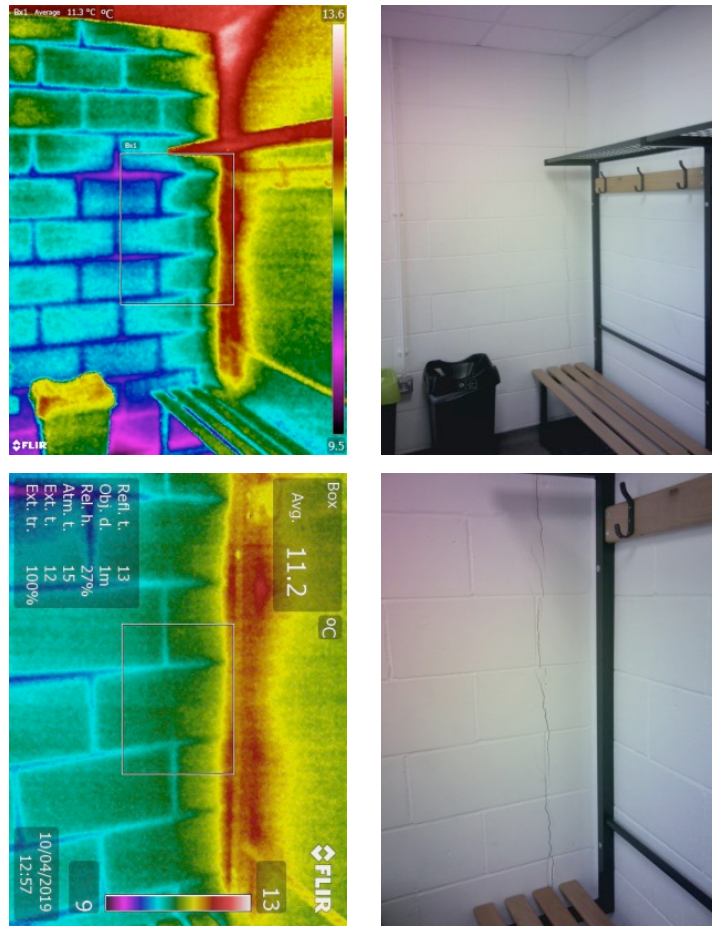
Thermal images and digital images of cracks in the internal wall (changing room 2)
